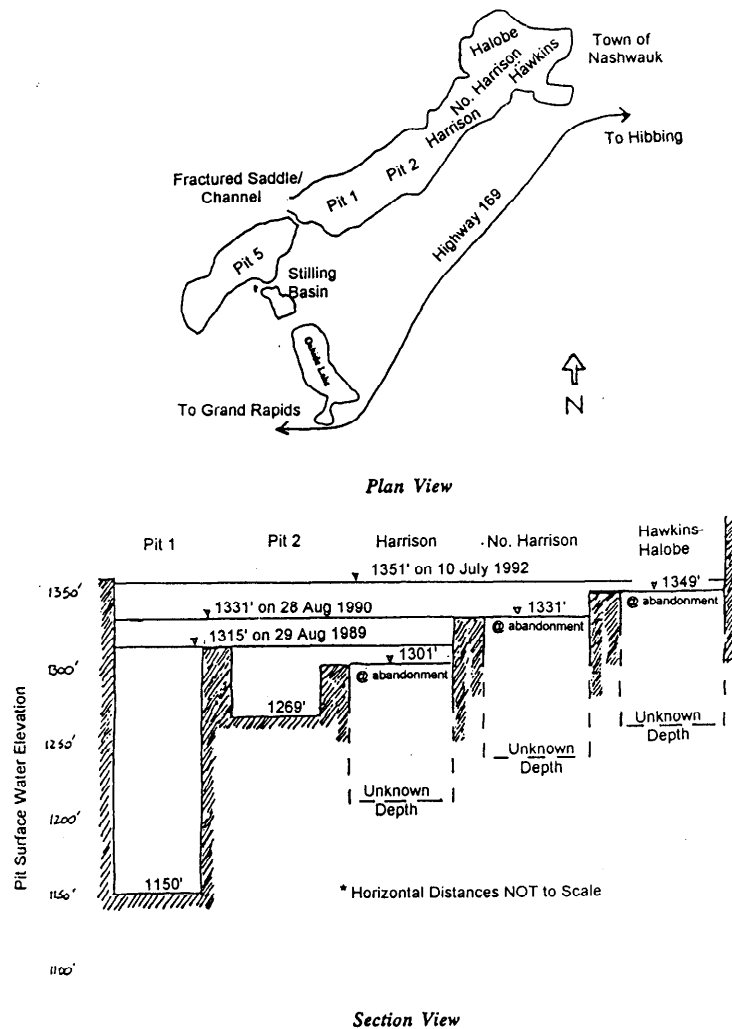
Plan and Section View of the Butler Pit Complex (from Perry and Brooks, 1993)
